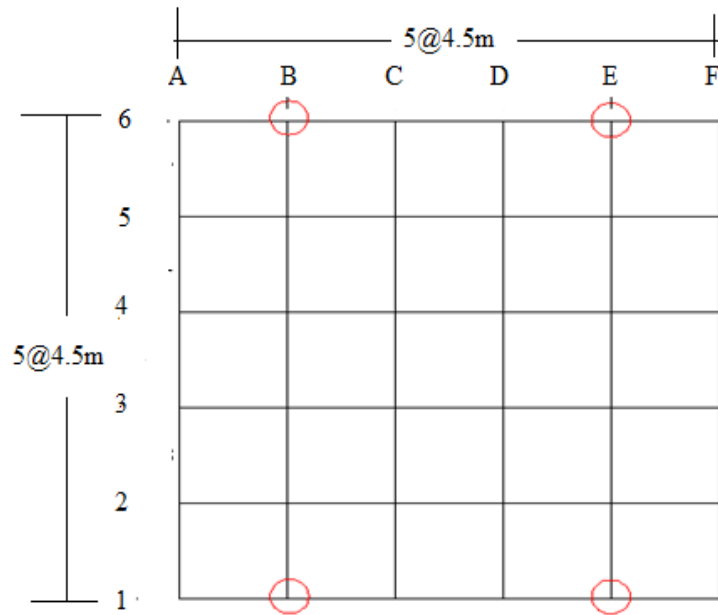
2 Plan view of building with column floated at outer periphery of ground floor
